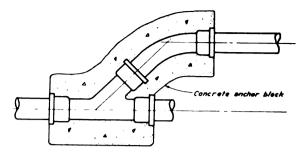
Typical concrete anchor block for cast iron underground waterlines.
